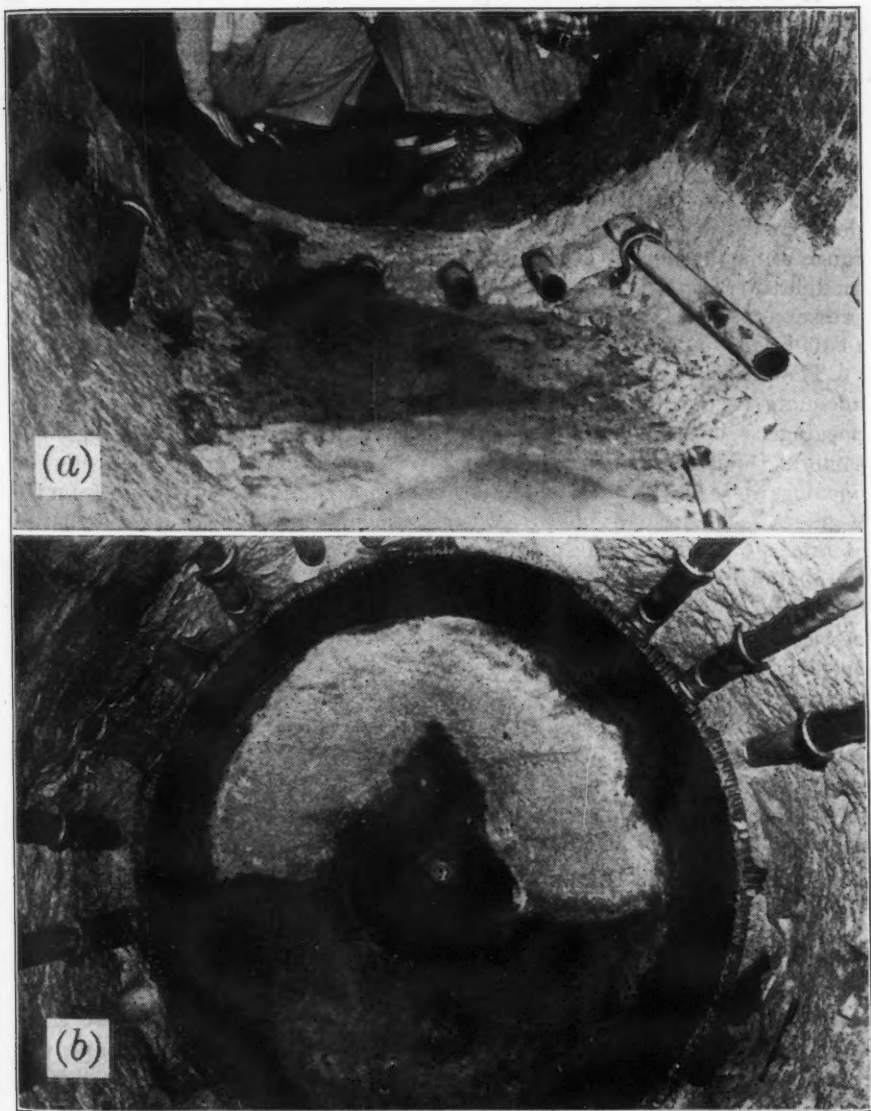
REMAINS OF 2-IN. AIR PIPES, SHOSHONE DAM: (a) Vent of a 52-In. Conduit Facing Downstream from the East Valve; (b) East Conduit
